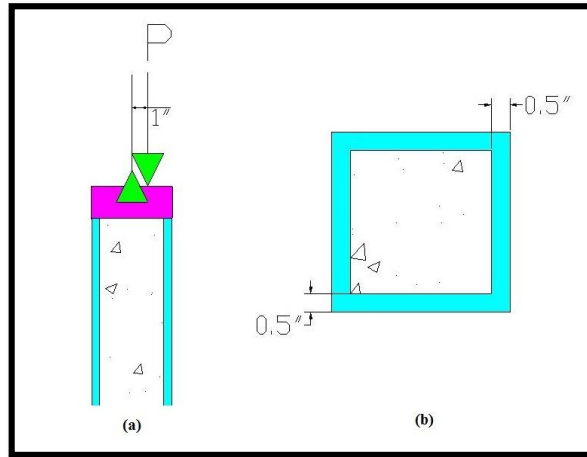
Specimen Geometry (a) Longitudinal Section with Steel Plates (b) Cross Section.
